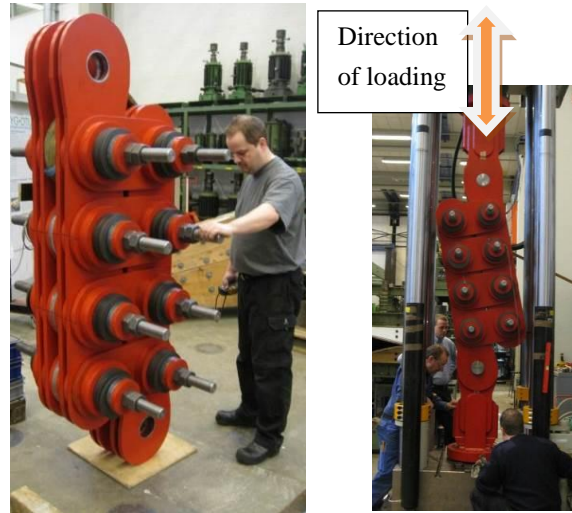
5000 kN Damper Tests at the Technical University of Denmark
